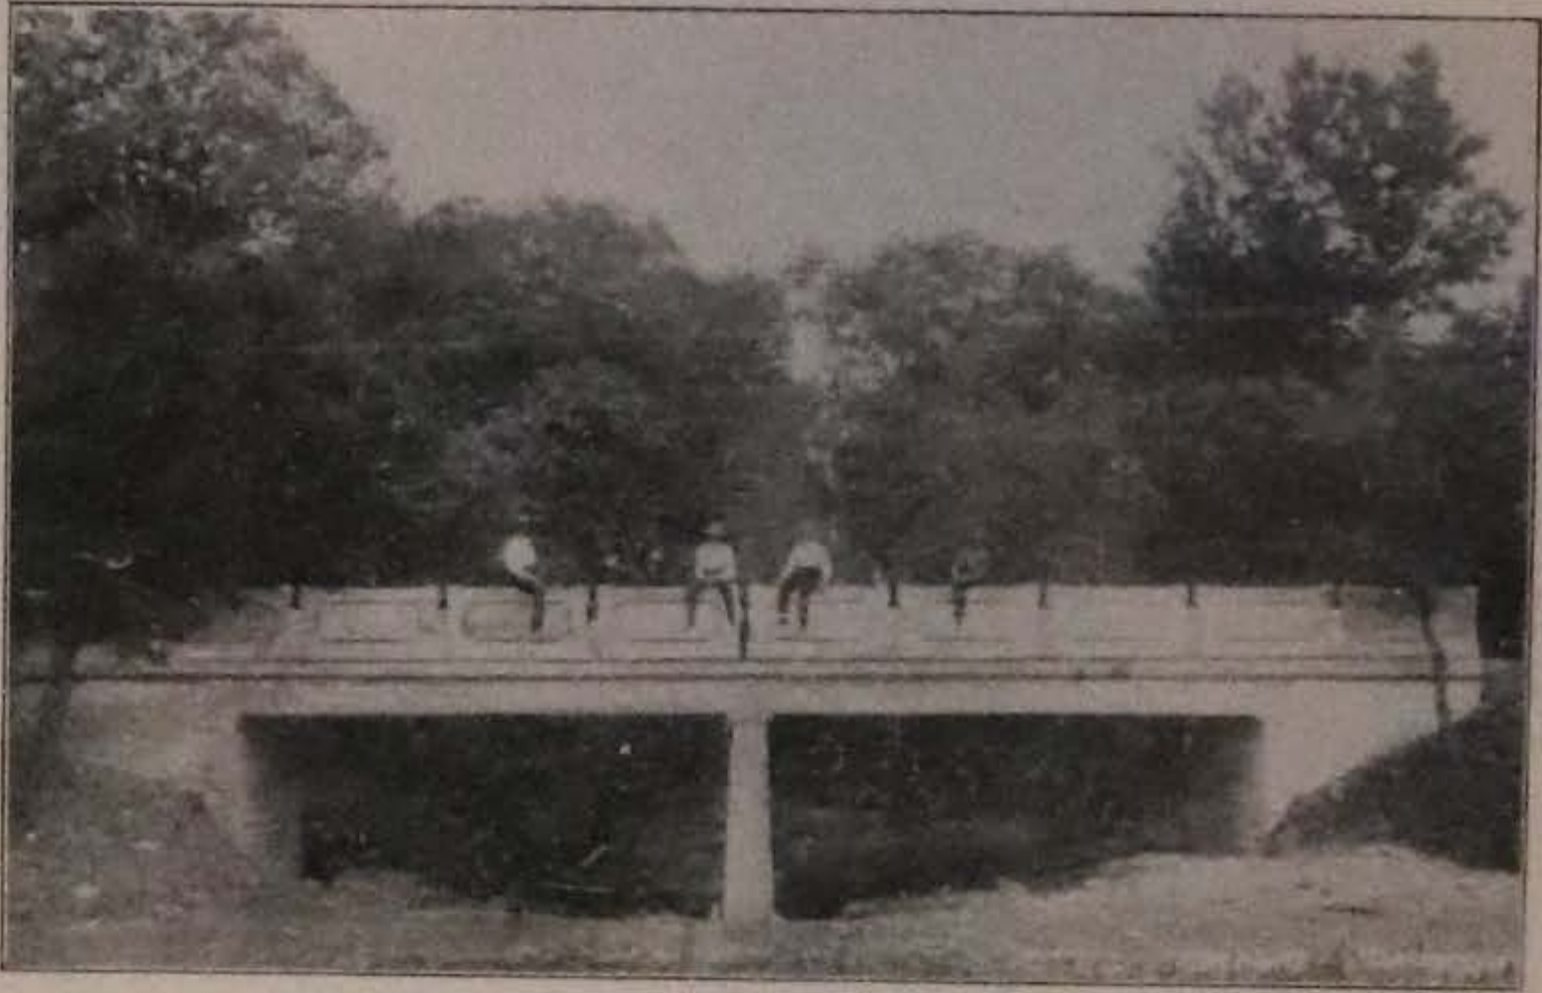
SLAB OR FLAT TOP CULVERT NEAR ADEL, IOWA
